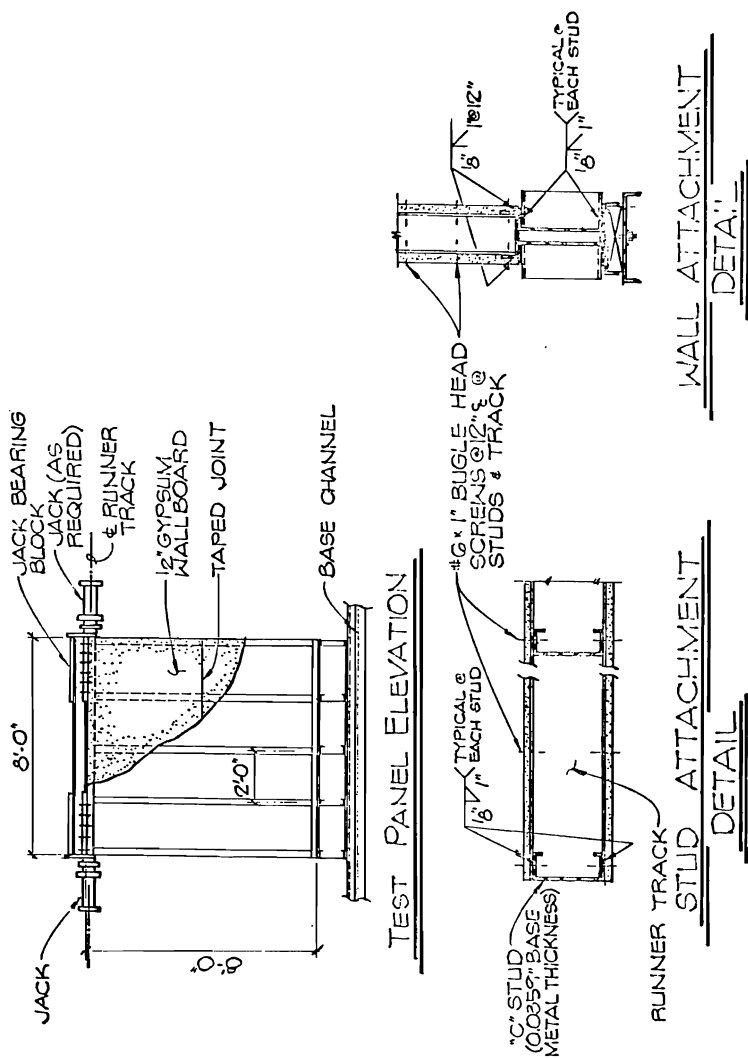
Test Assembly Plan & Details - Wall Type "P"
